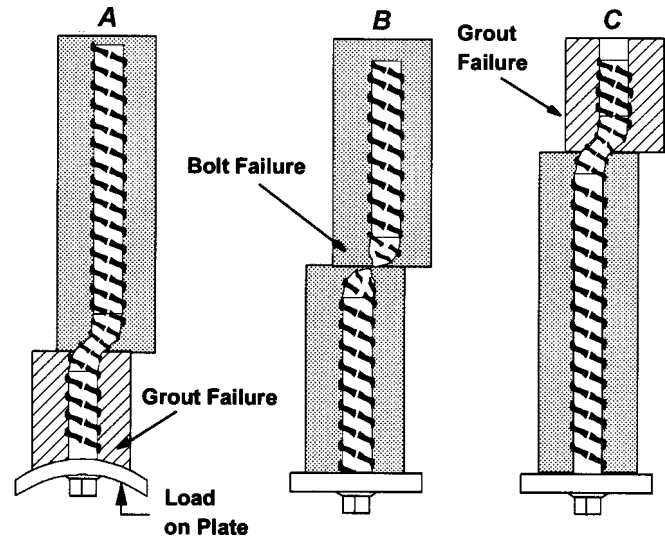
Failure mechanisms of a fully grouted bolt [after Serbousek and Signer 1987]. A, roof movement near head; B, roof movement in central portion; C, roof movement in anchorage zone.
